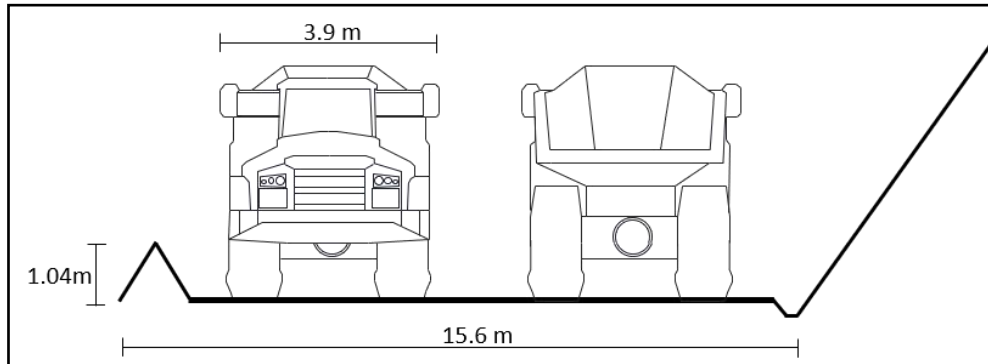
Typical Mine Ramp Configuration (In-Pit)
